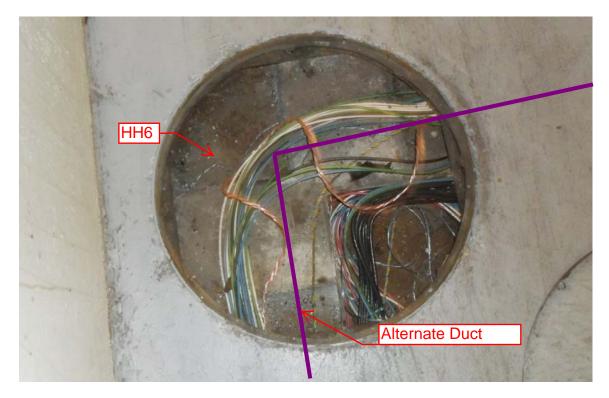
Alternate Duct entry to Shared Trough in Room W202.
